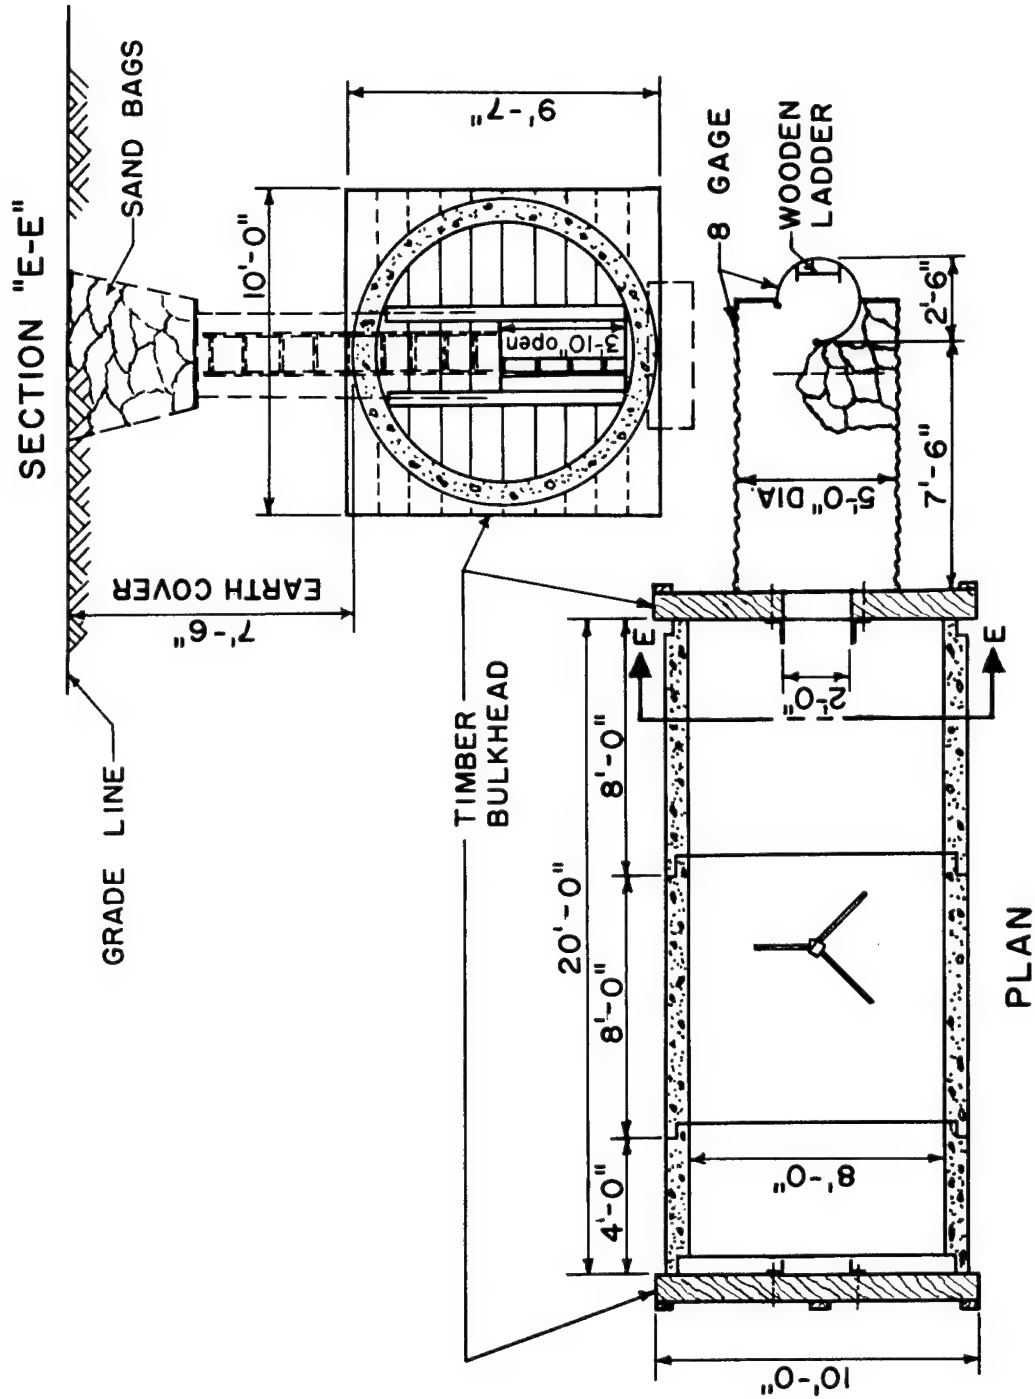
Typical concrete conduit sections used in the 3.2 structures (Priscilla Shot).
